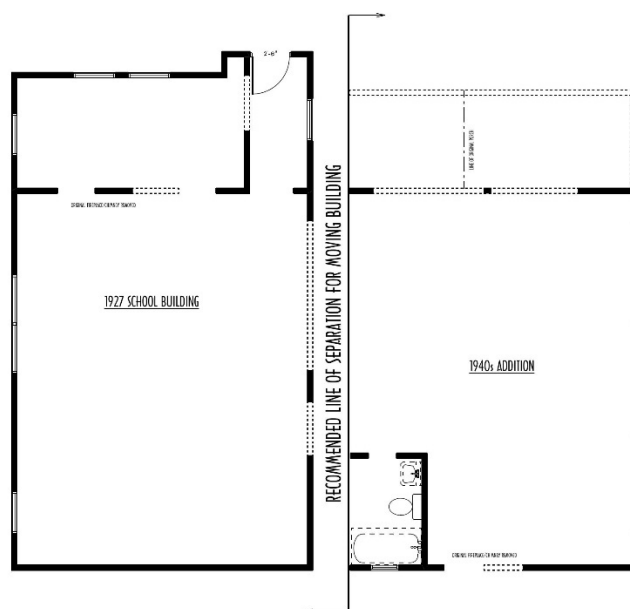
Floor plan showing the recommended separation of the Lee-Buckner School. Drawing by Amanda Floyd.
